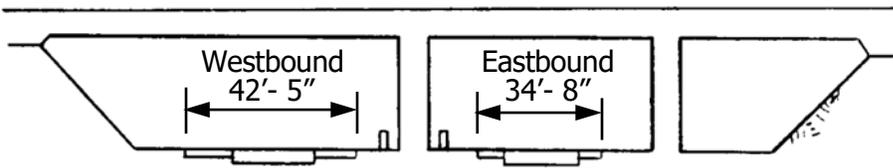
Bridge elevation view of horizontal clearances for highway feature carrying mainline and ramp traffic below the bridge.
